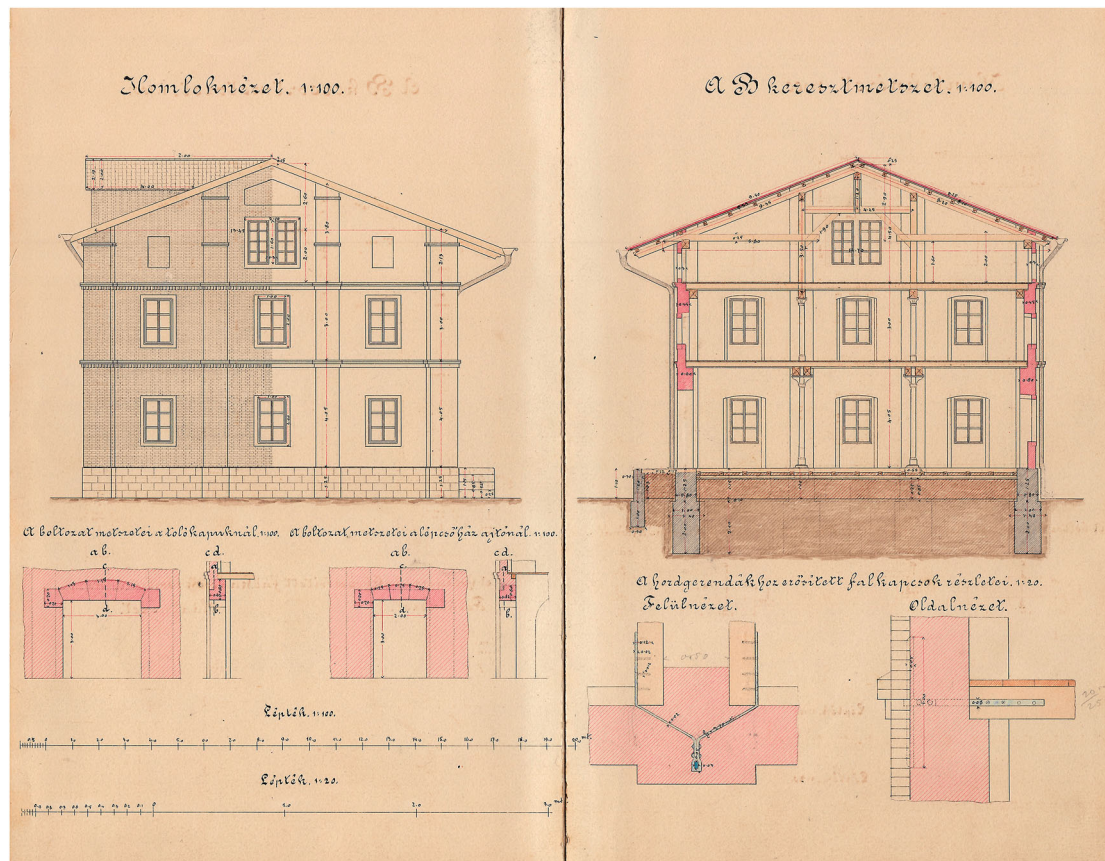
Western Warehouse, façade and transverse section. State Archives in Rijeka (HR-DARI), reproduced with permission.
